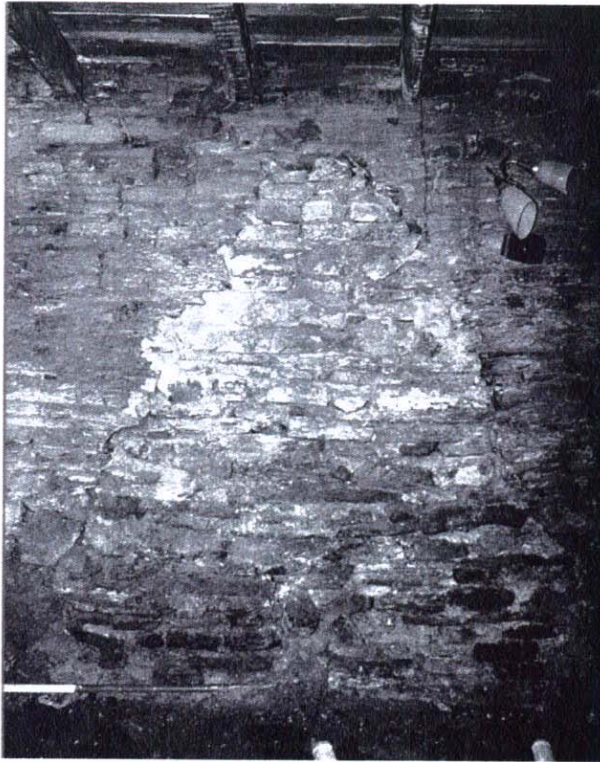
Ground floor LH room (E wall showing rebuilt fireplace back). Most of this wall is of an early date, built of fine rubble masonry and with putlog holes.
